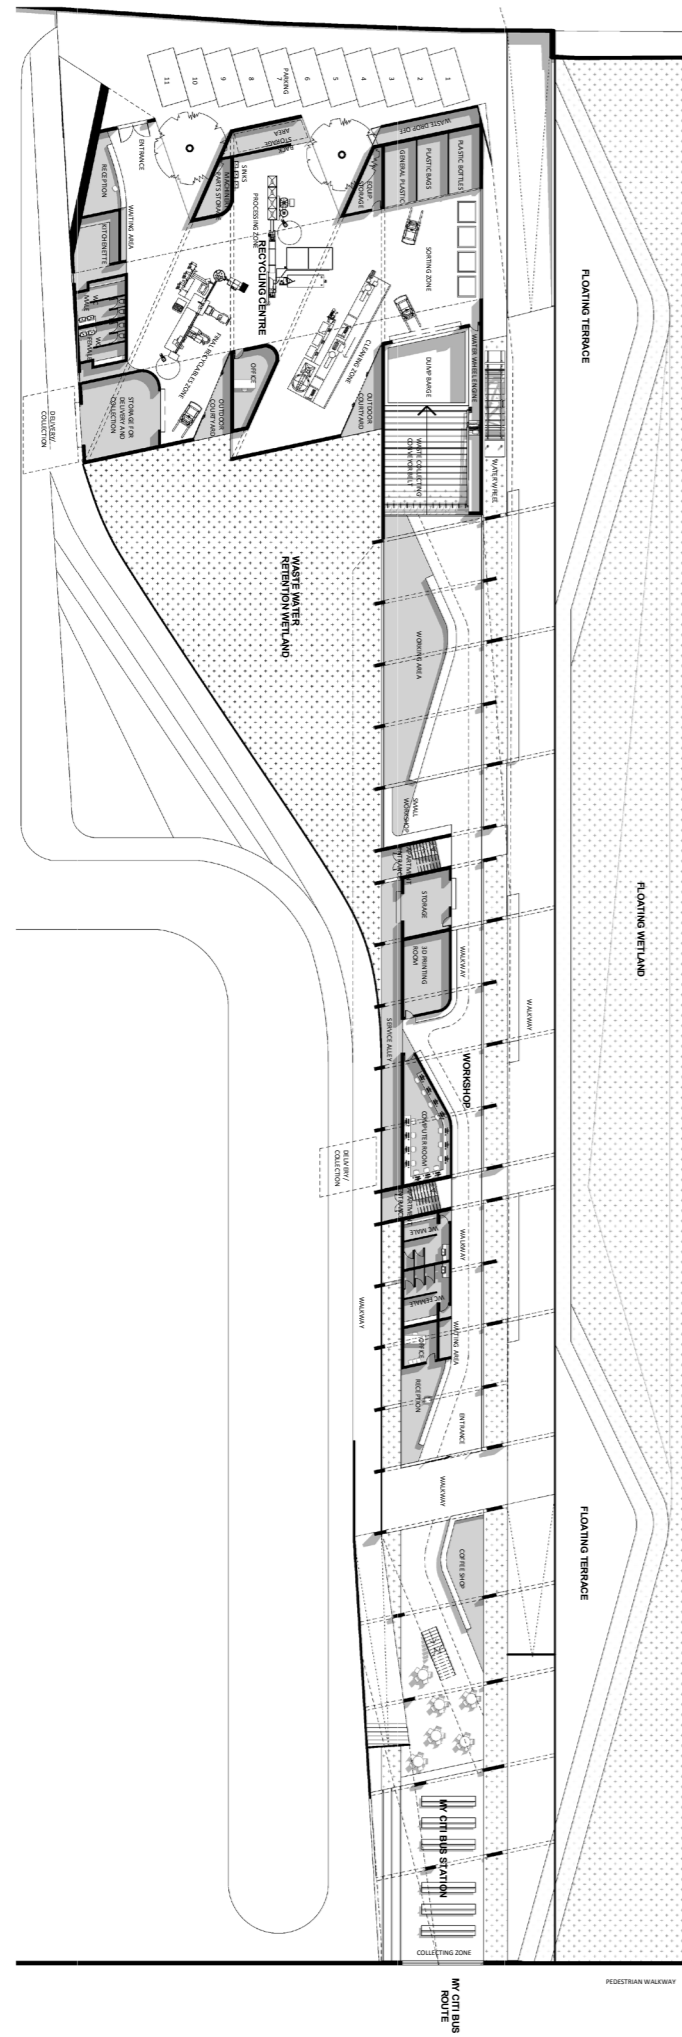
Plan of recycling centre and workshop illustrating the interior space as separate systems to the structure.
